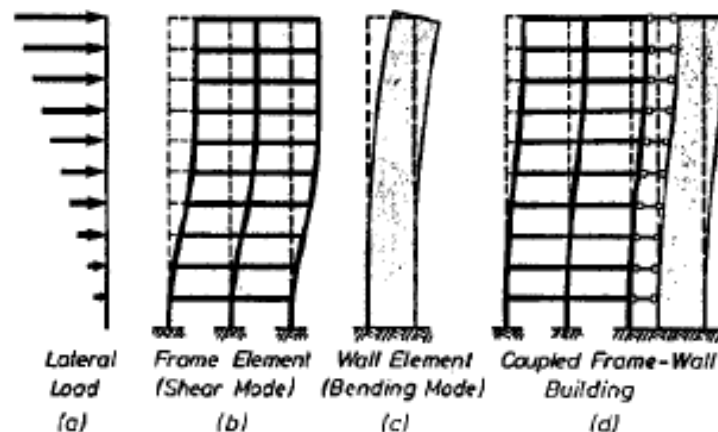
Deformation patterns due to lateral forces of a frame, a wall element, and a dual system (source: Paulay and Priestley (1993)).
